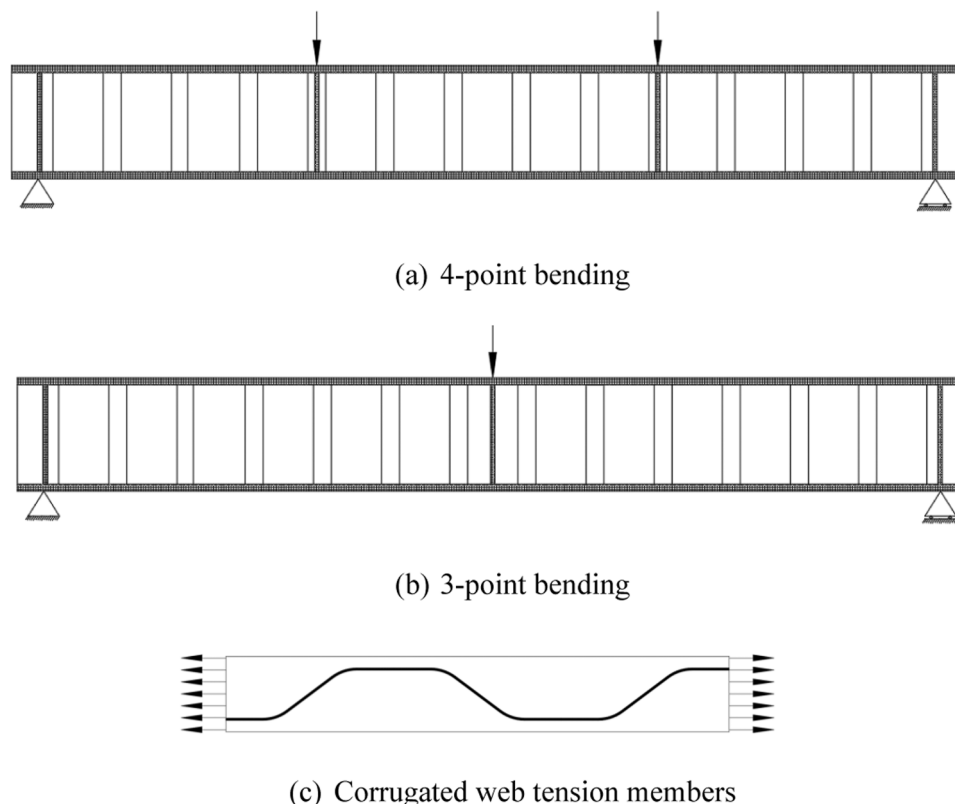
Overview of the types of test specimens used to evaluate the fatigue performance of the welded connection between flange and corrugated web.
